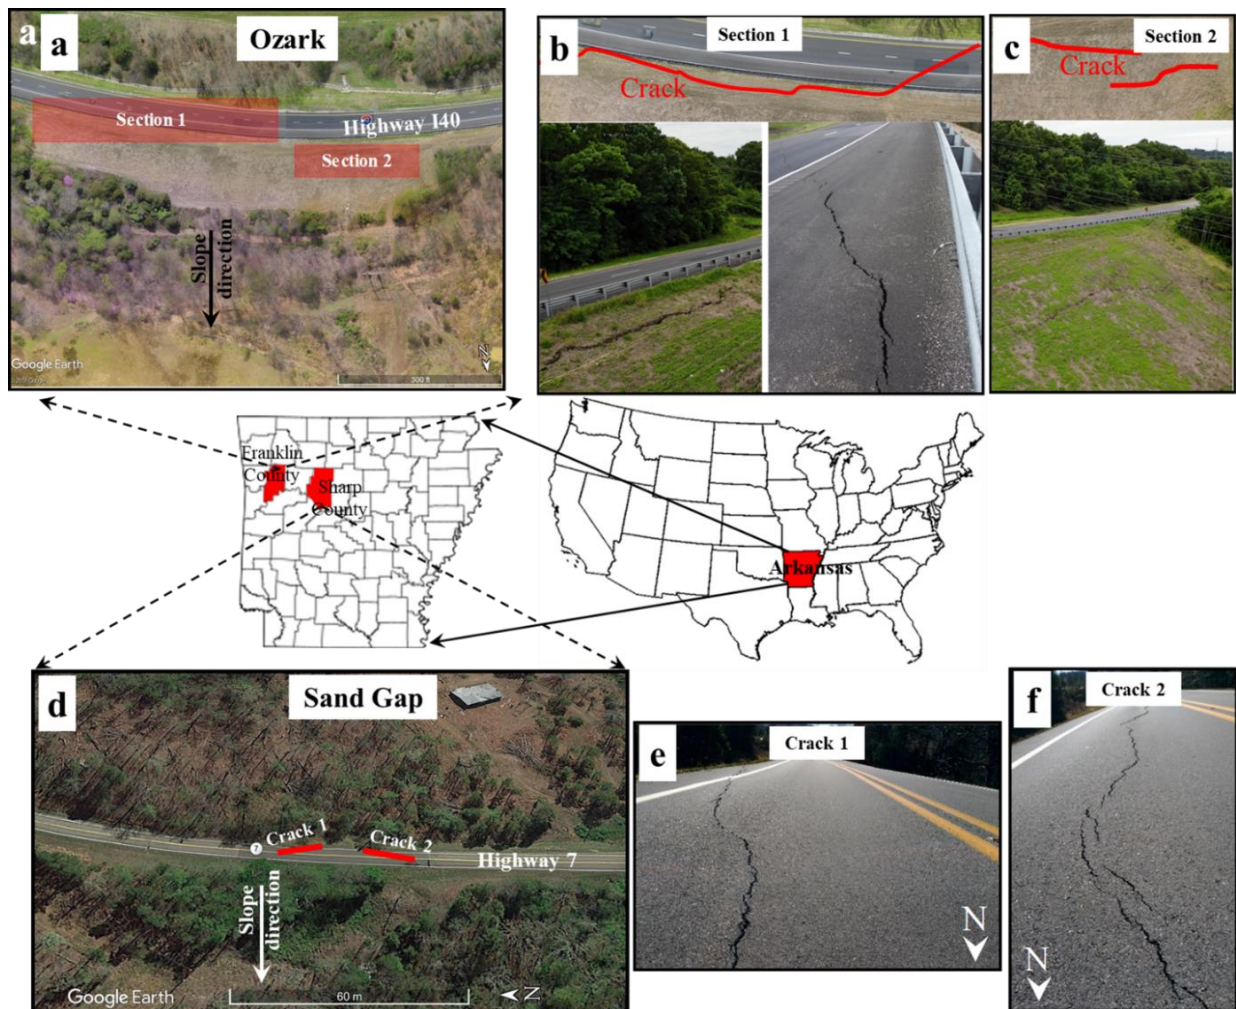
Study areas and landslide movements observed. a) Ozark site, b) cracking observed in section 1, c) cracking observed in section 2, d) Sand Gap site, e) crack 1, f) crack 2.
